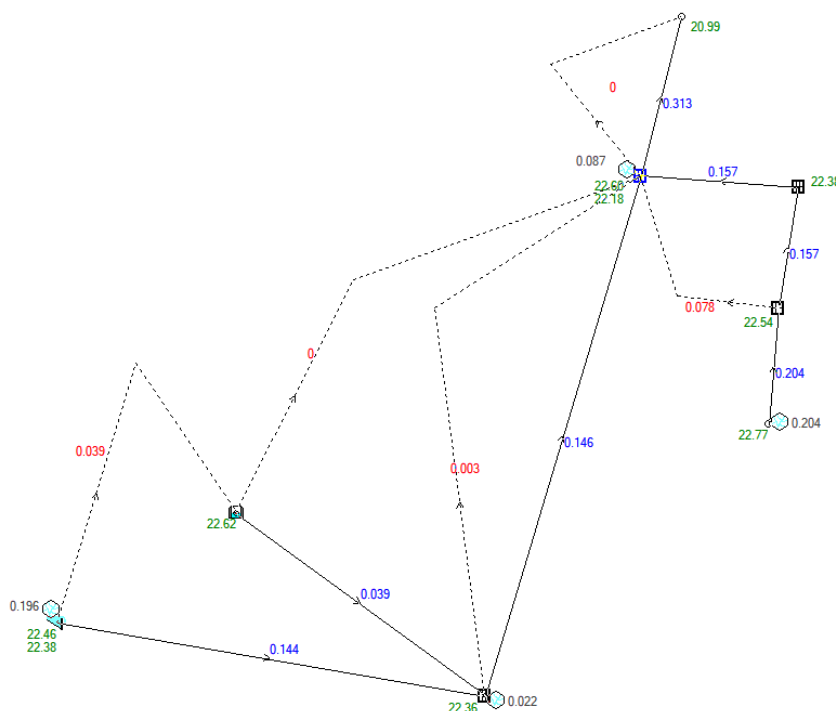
Proposed 100 year Drainage Layout Cavill Av Railway Crossing in DRAINS
